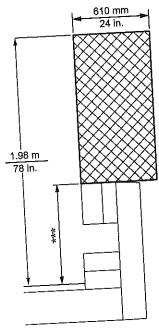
Zone of Intrusion for TL-3 Concrete Barriers and Steel Tubular Rails on Curbs
